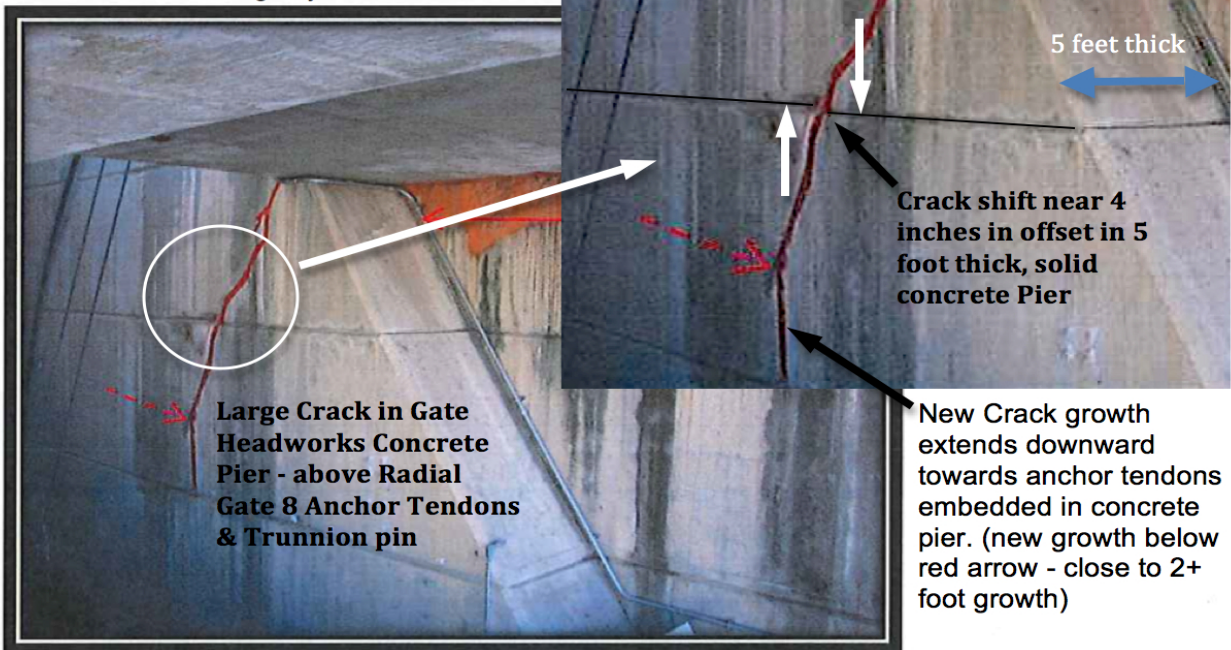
Gate Headworks cracked reinforced concrete pier support structure.
